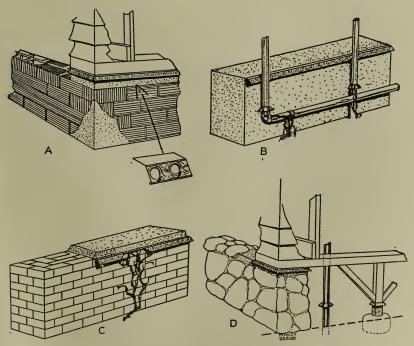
How to insulate foundation units of hollow tile or solid masonry against termites. A, Foundation wall of hollow tile surfaced with stucco, showing metal termite shield in place. Notice how the top of the wall is capped with sheet slate and concrete. B, Concrete wall with termite shield at top, the horizontally laid piping fitted above bend with metal shield to shut off termite tubes. The vertical pipe also has a termite shield. C, Brick wall fitted with termite shield and capped with concrete. Notice how the shield mechanically blocks the earthlike shelter tubes of the termites. D, Stone wall fitted with termite shield and capped with concrete, the wooden posts insulated from the ground with base stone and concrete block. Notice the termite shields on the post and piping
